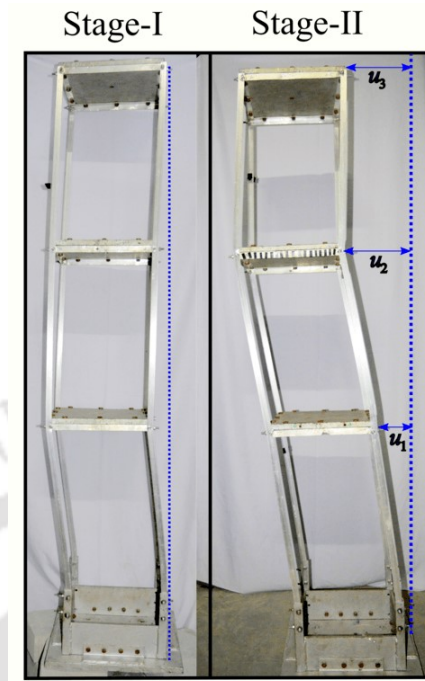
Plastic deformed shape of shear structure after experiment-5 of stage-I and stage-
